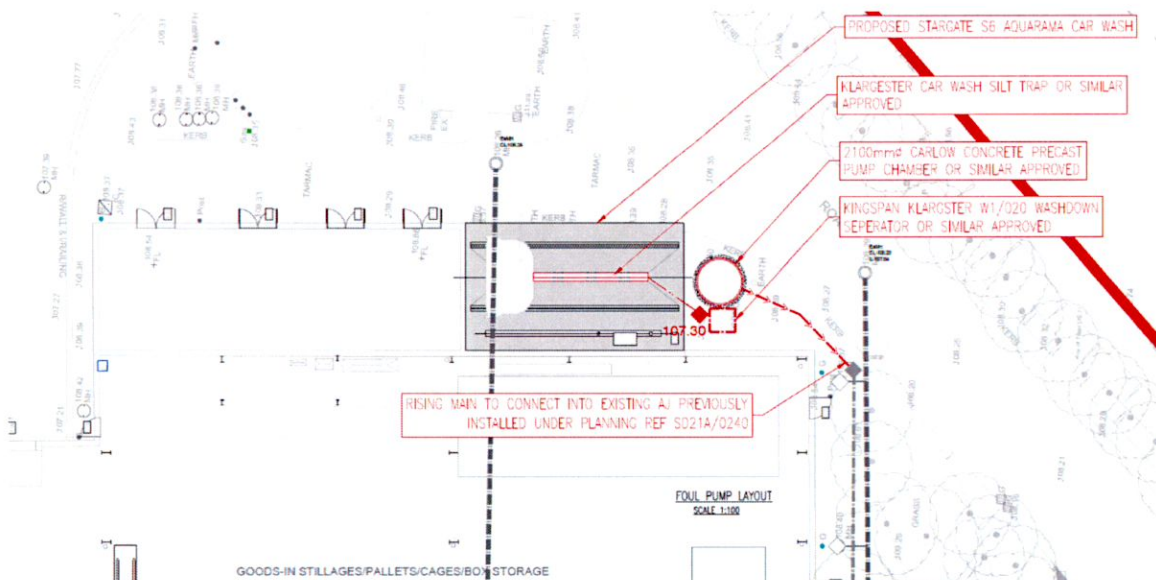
Proposed Site Plan showing internal uses and layout. (dwg. no. CS-SP-DR-C-5310, DBFL Engineers)
